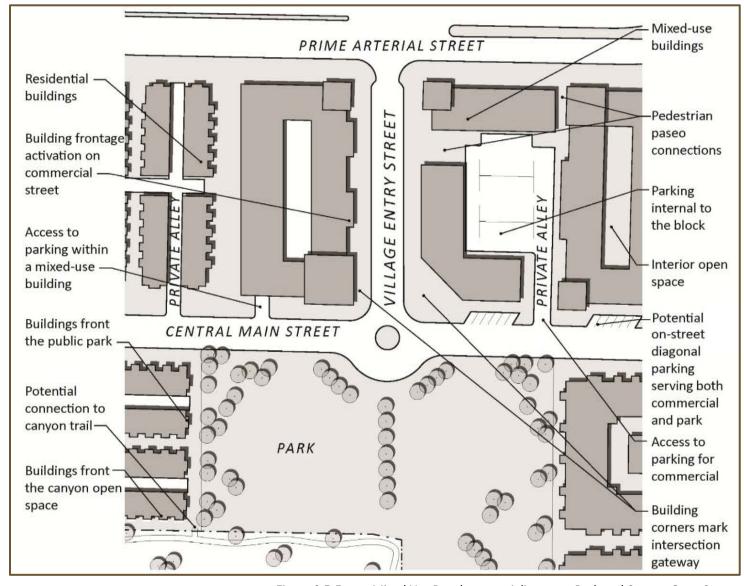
Mixed Use Development Adjacent to Park and Canyon Open Space
